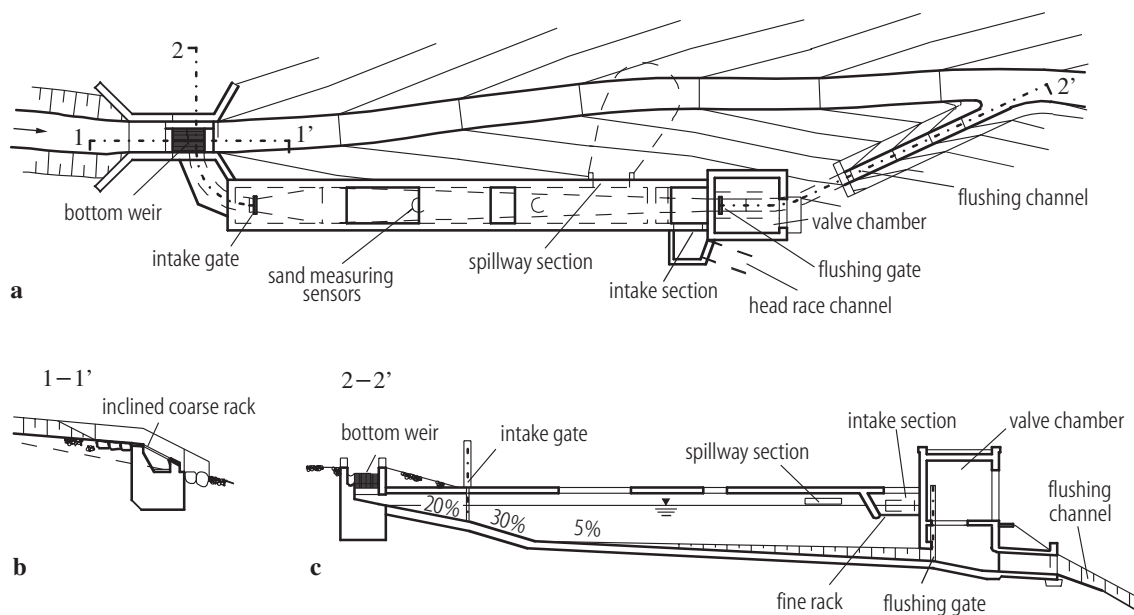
(a) Bottom weir with desilting chamber, plan view. (b) Cross-section 1-1'. (c) Cross-section 2-2'.
